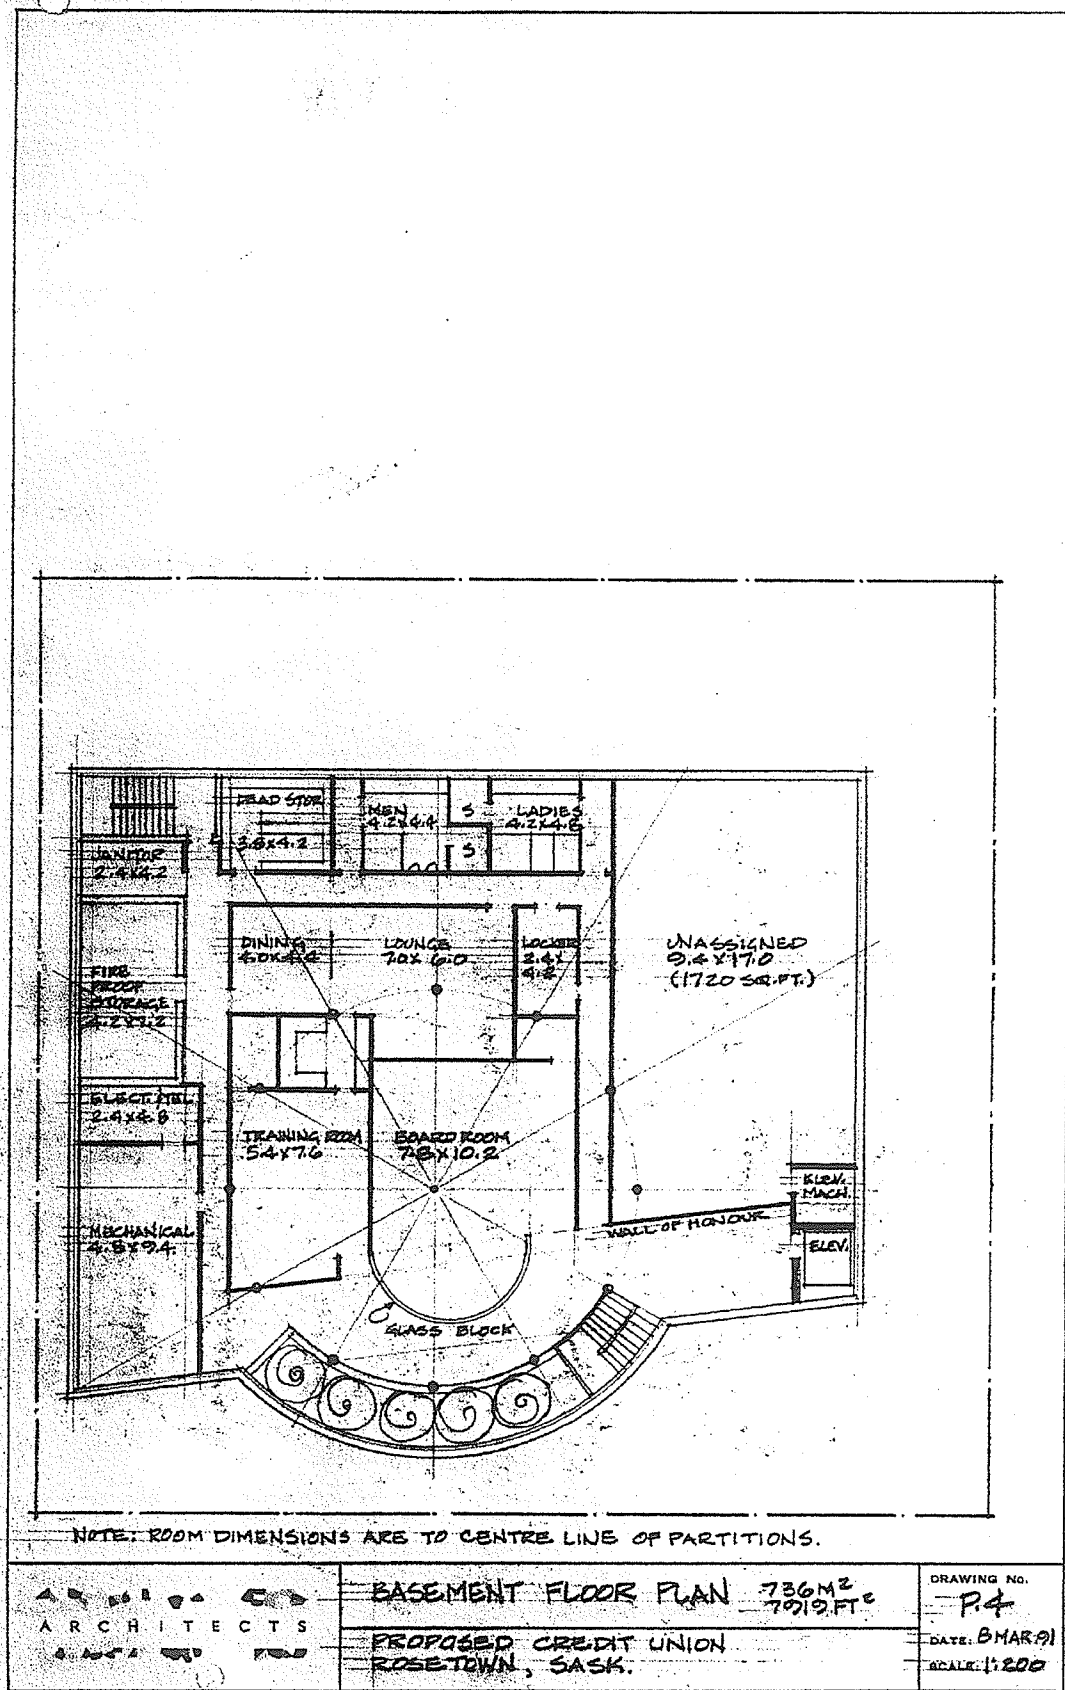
Architect design sketch 4, Basement Floor Plan. Courtesy of the architect.
